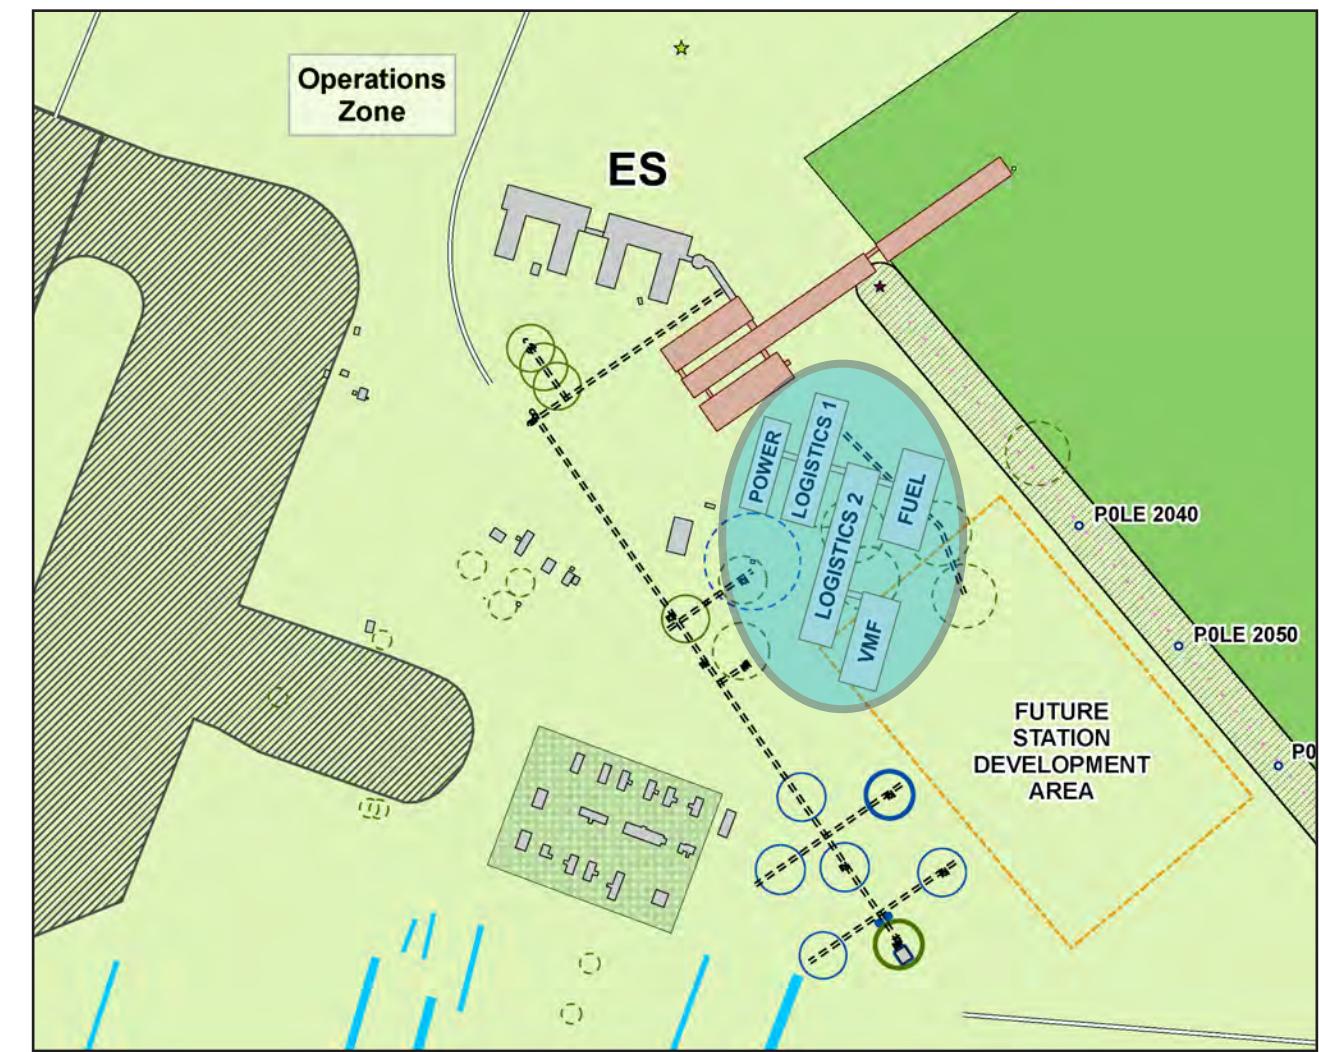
Master Plan Operations Zone Core: General area for an elevated snow pad. For illustrative purposes only; the arch replacement facilities layout requires additional study prior to finalization.
